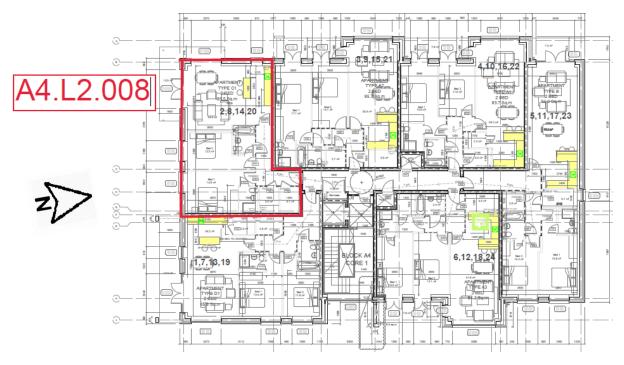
Floor Layout of the Existing Block A4 (Bridgefield)—Second Floor
